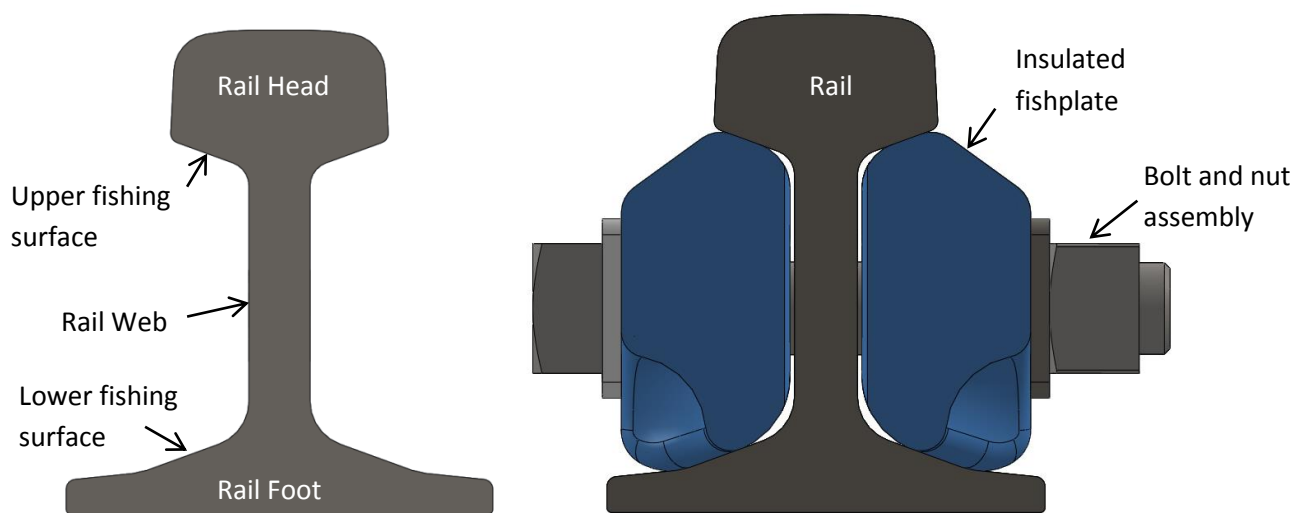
Image showing rail terminology and a wedge fit dry IBJ cross section
